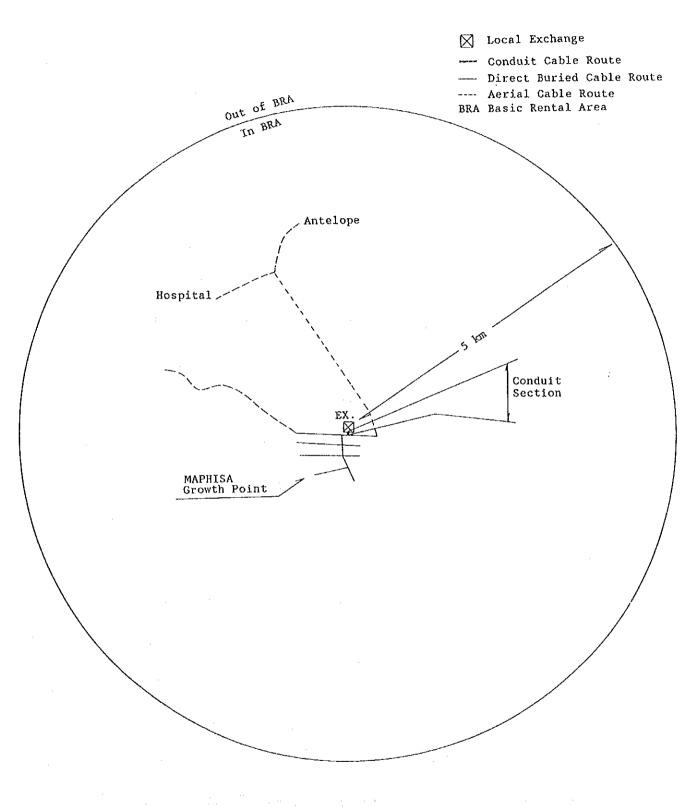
(2/6) Local Cable Distribution Plan in BRA (Kezi Exchange)
